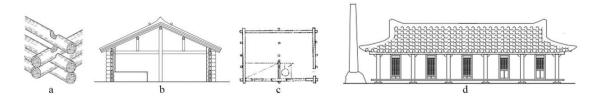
Schematic Diagram of Typical Dwellings in Traditional Villages. a) Stacking structure of log cabin; b) Section drawing of a typical log cabin; c) Plan of typical log cabin; d) Elevation of The *Century-old House* in Bailong Village
